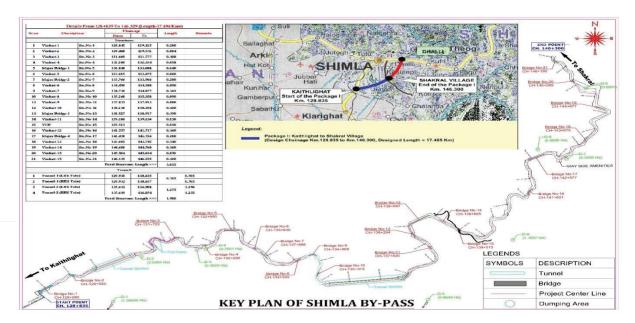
Key Plan – Package 1, Shimla Bypass Project
